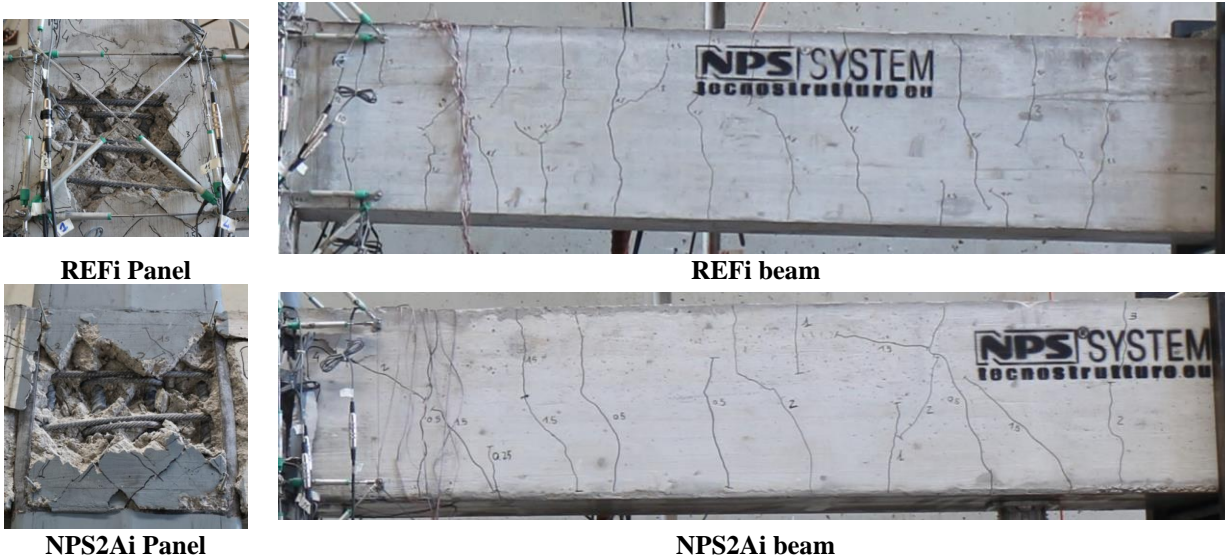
View of Beam and Joint Region of Specimens NPS2Ai and REFi at Failure
